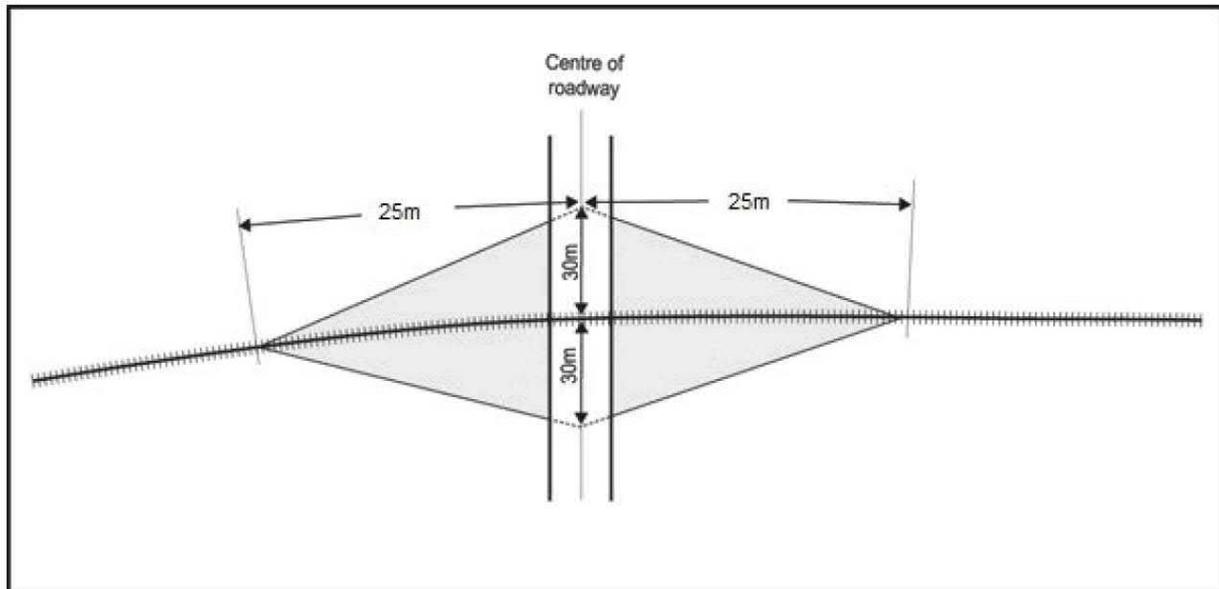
Approach sight triangles for public road/rail siding level crossings.
